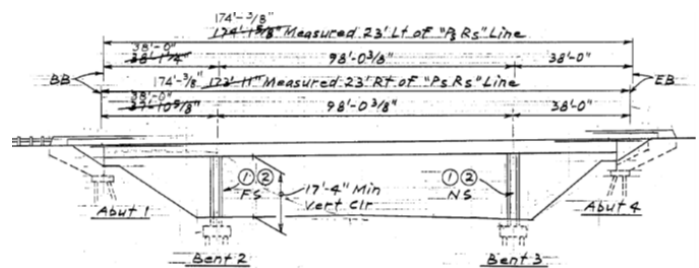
Elevation; General plan of prototype bridge (49-0165L).
